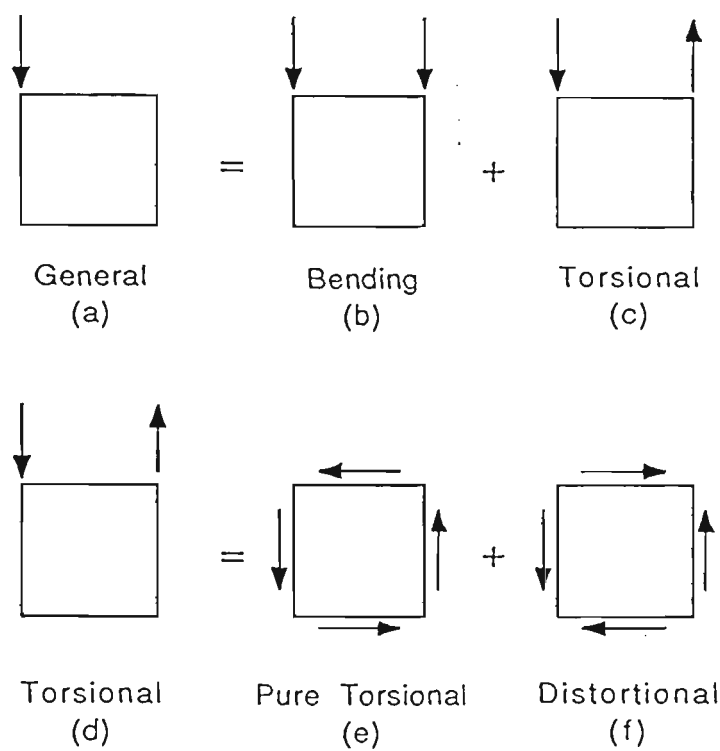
Component of box girder loading (Wright, et.al., 1968)
